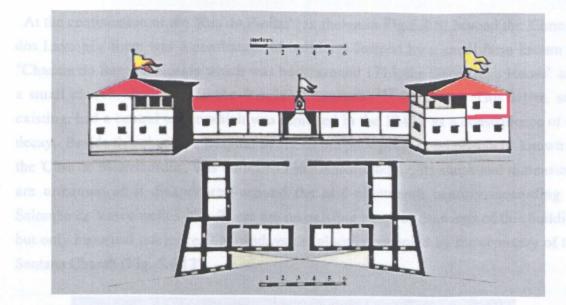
facade and plan of the Dragoon's Barracks
